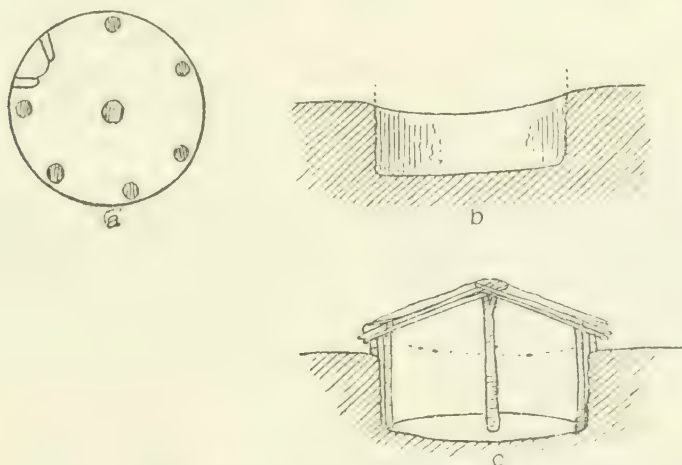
PLAN AND SECTIONS SHOWING CONSTRUCTION OF PIT HOUSES.
